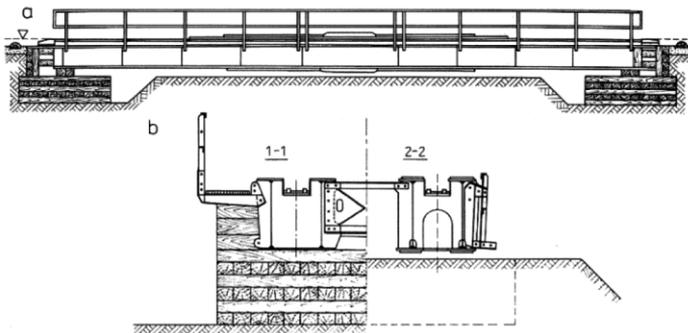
Bridge-type stress-relieving structure; two box girder system type KO-21/73 ('Central Office', 1997; Miklin & Sawicki, 1993): a - longitudinal view, b - cross-section, 1-1 cross-section at support with folded pavement, 2-2 cross-section in the span with folded pavement
